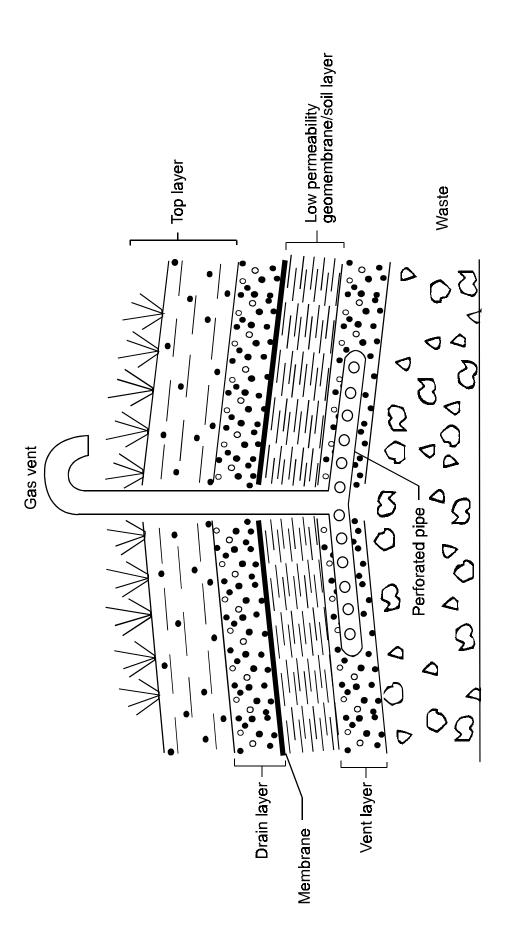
Cover With Gas Vent Outlet and Vent Layer
